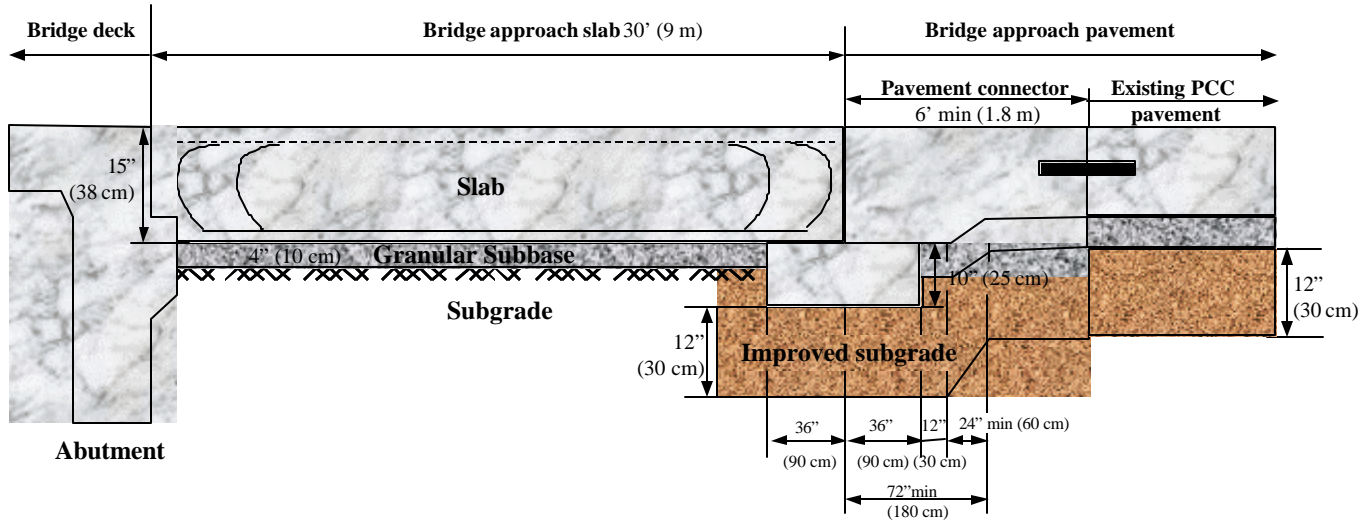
Typical IDOT design of a bridge approach slab connecting the bridge with concrete pavement
